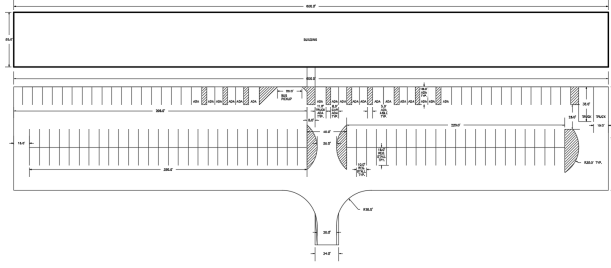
Bird's-eye-view of building and parking lot, drawn in Civil3D
